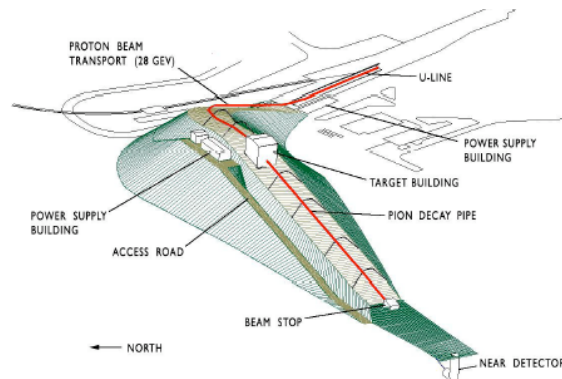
Elevation view of the neutrino beam line to Homestake, South Dakota.
